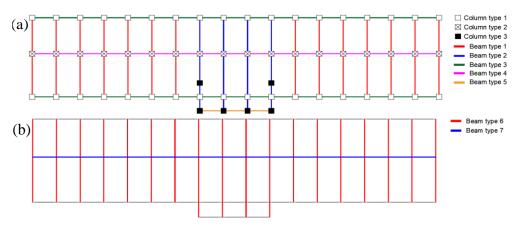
Characterization of beams and columns within the RC structure [26]: (a) typical story; (b) 261 roof. 262
